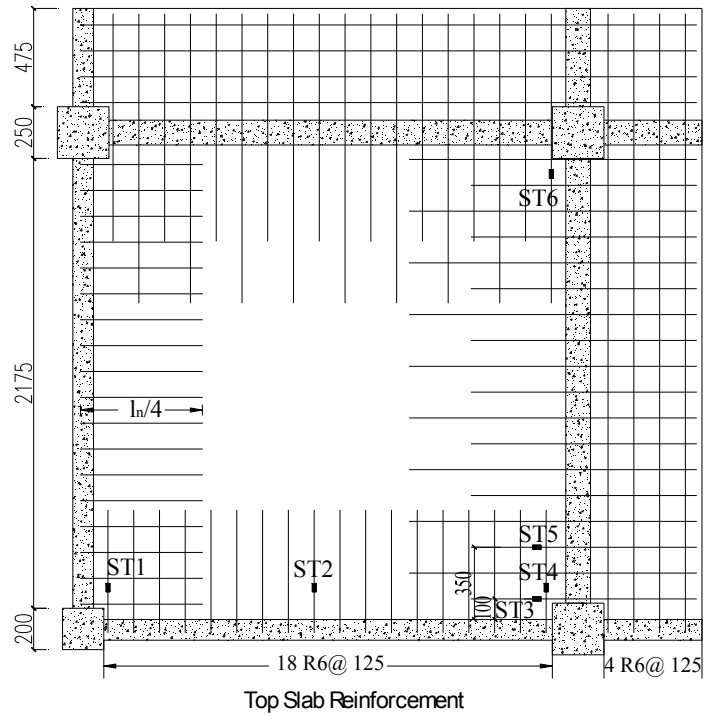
Typical detailing of slab for non-seismically detailed specimen
